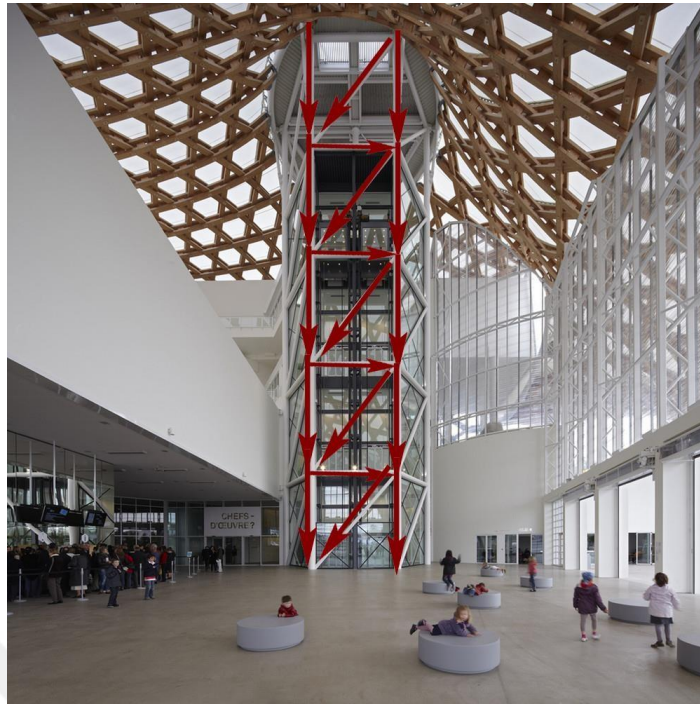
Load path on the Core Steel Ring Structure (ArchDaily)
